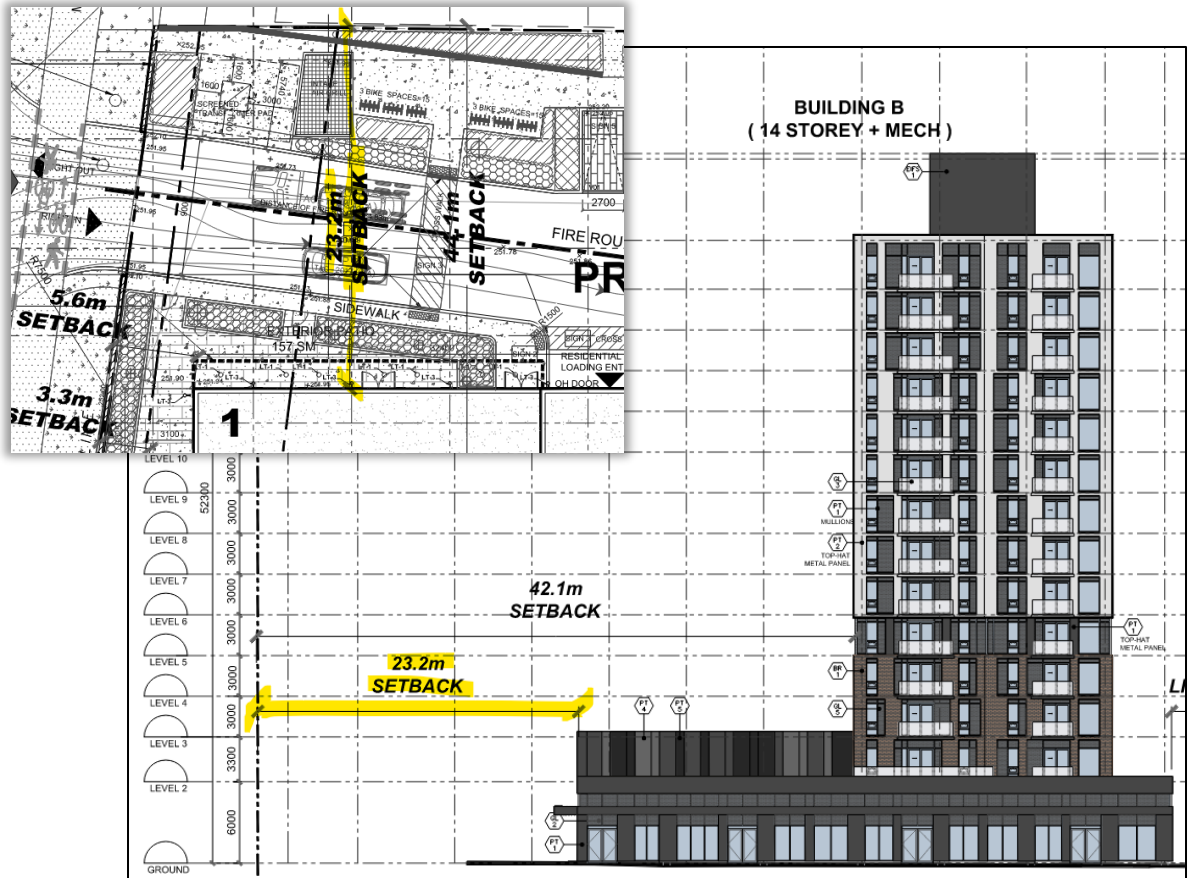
Elevation Plan – North Tower, West Elevation, with Proposed Variance #4 – minimum 23.2m north interior side yard setback for the first five storeys of the North Tower
